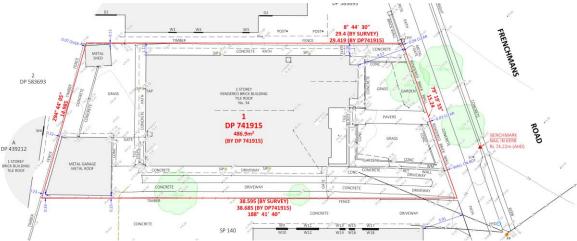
Survey Plan - 34 Frenchmans Road, Randwick
